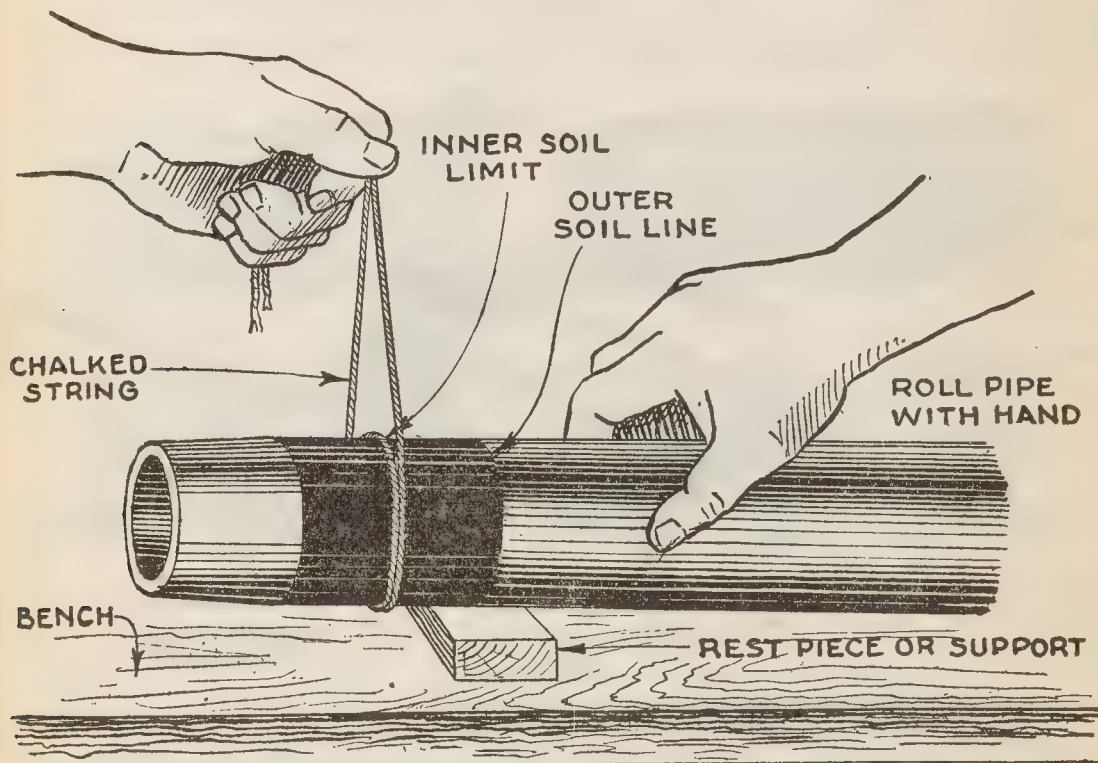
,439.—Preparing joint for wiping. 7. *Marking inner soil limit.
